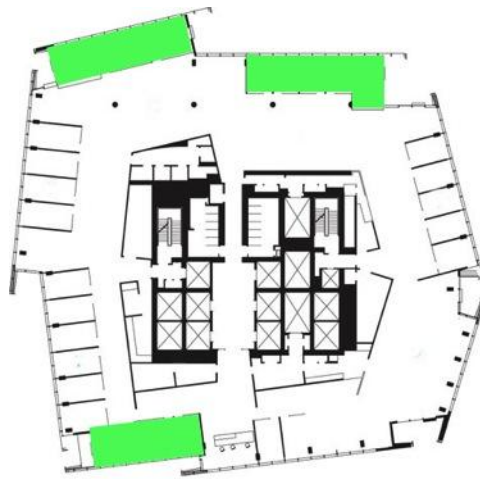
Office floor plan and the winter gardens (Adapted and Re-drawn; www.designalamic.com) Figure is not scaled
